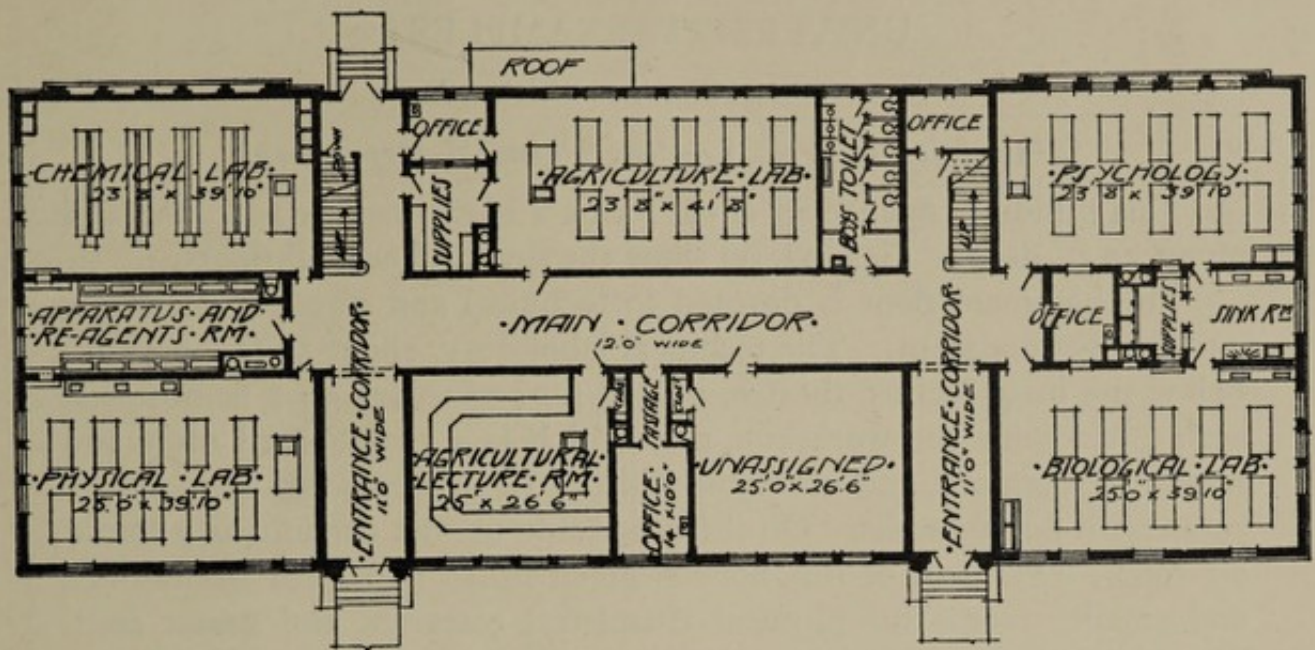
First Floor Plan, Science Buildings, Clifton College.
